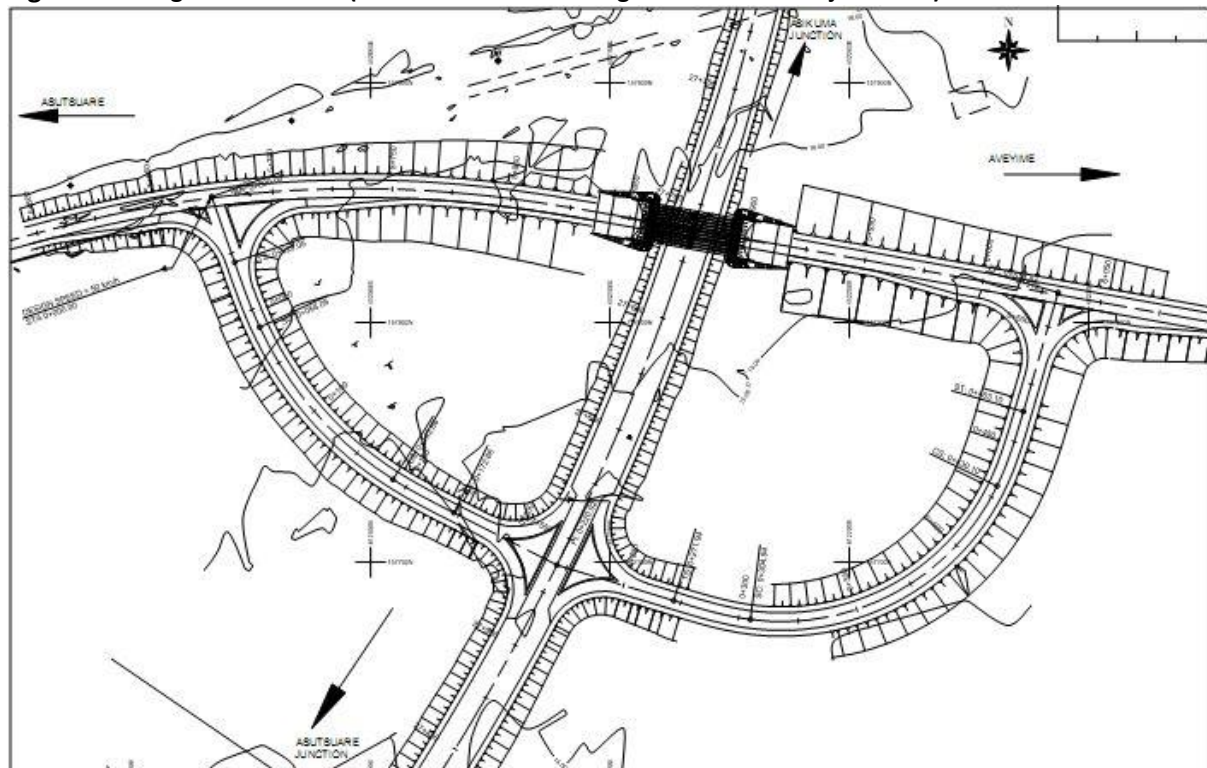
Layout of Volivo Interchange at CH. 29+350 on Section 1 Project Road
